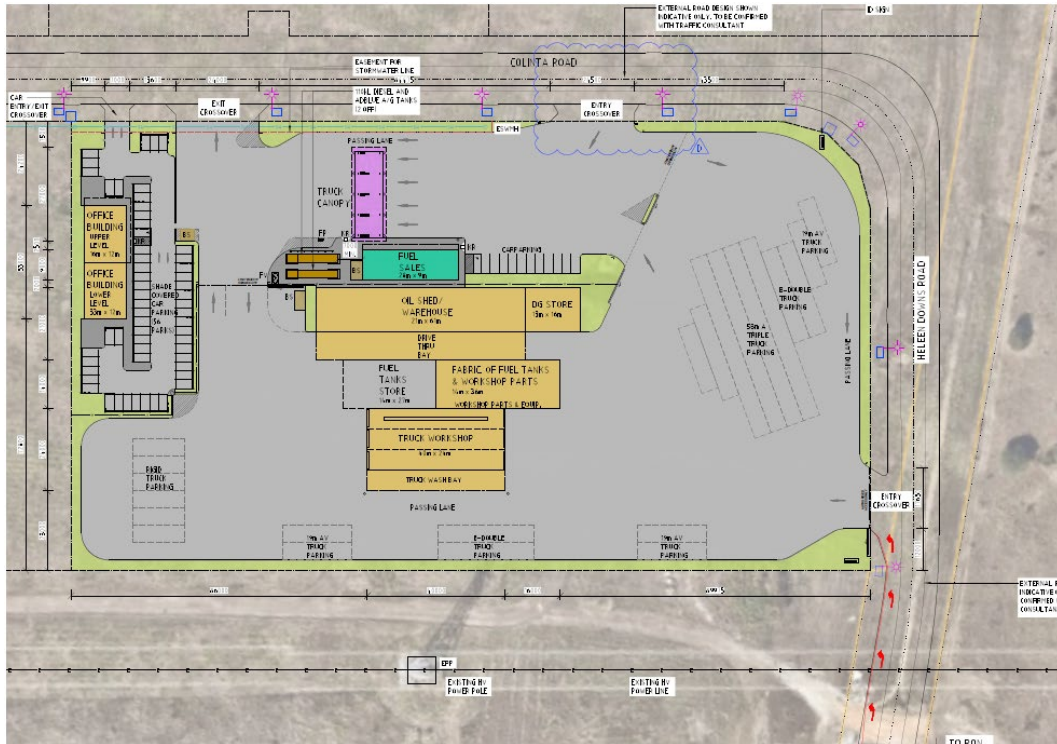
Amended Site Layout (TFA Drawing 23043-D02\_C)
